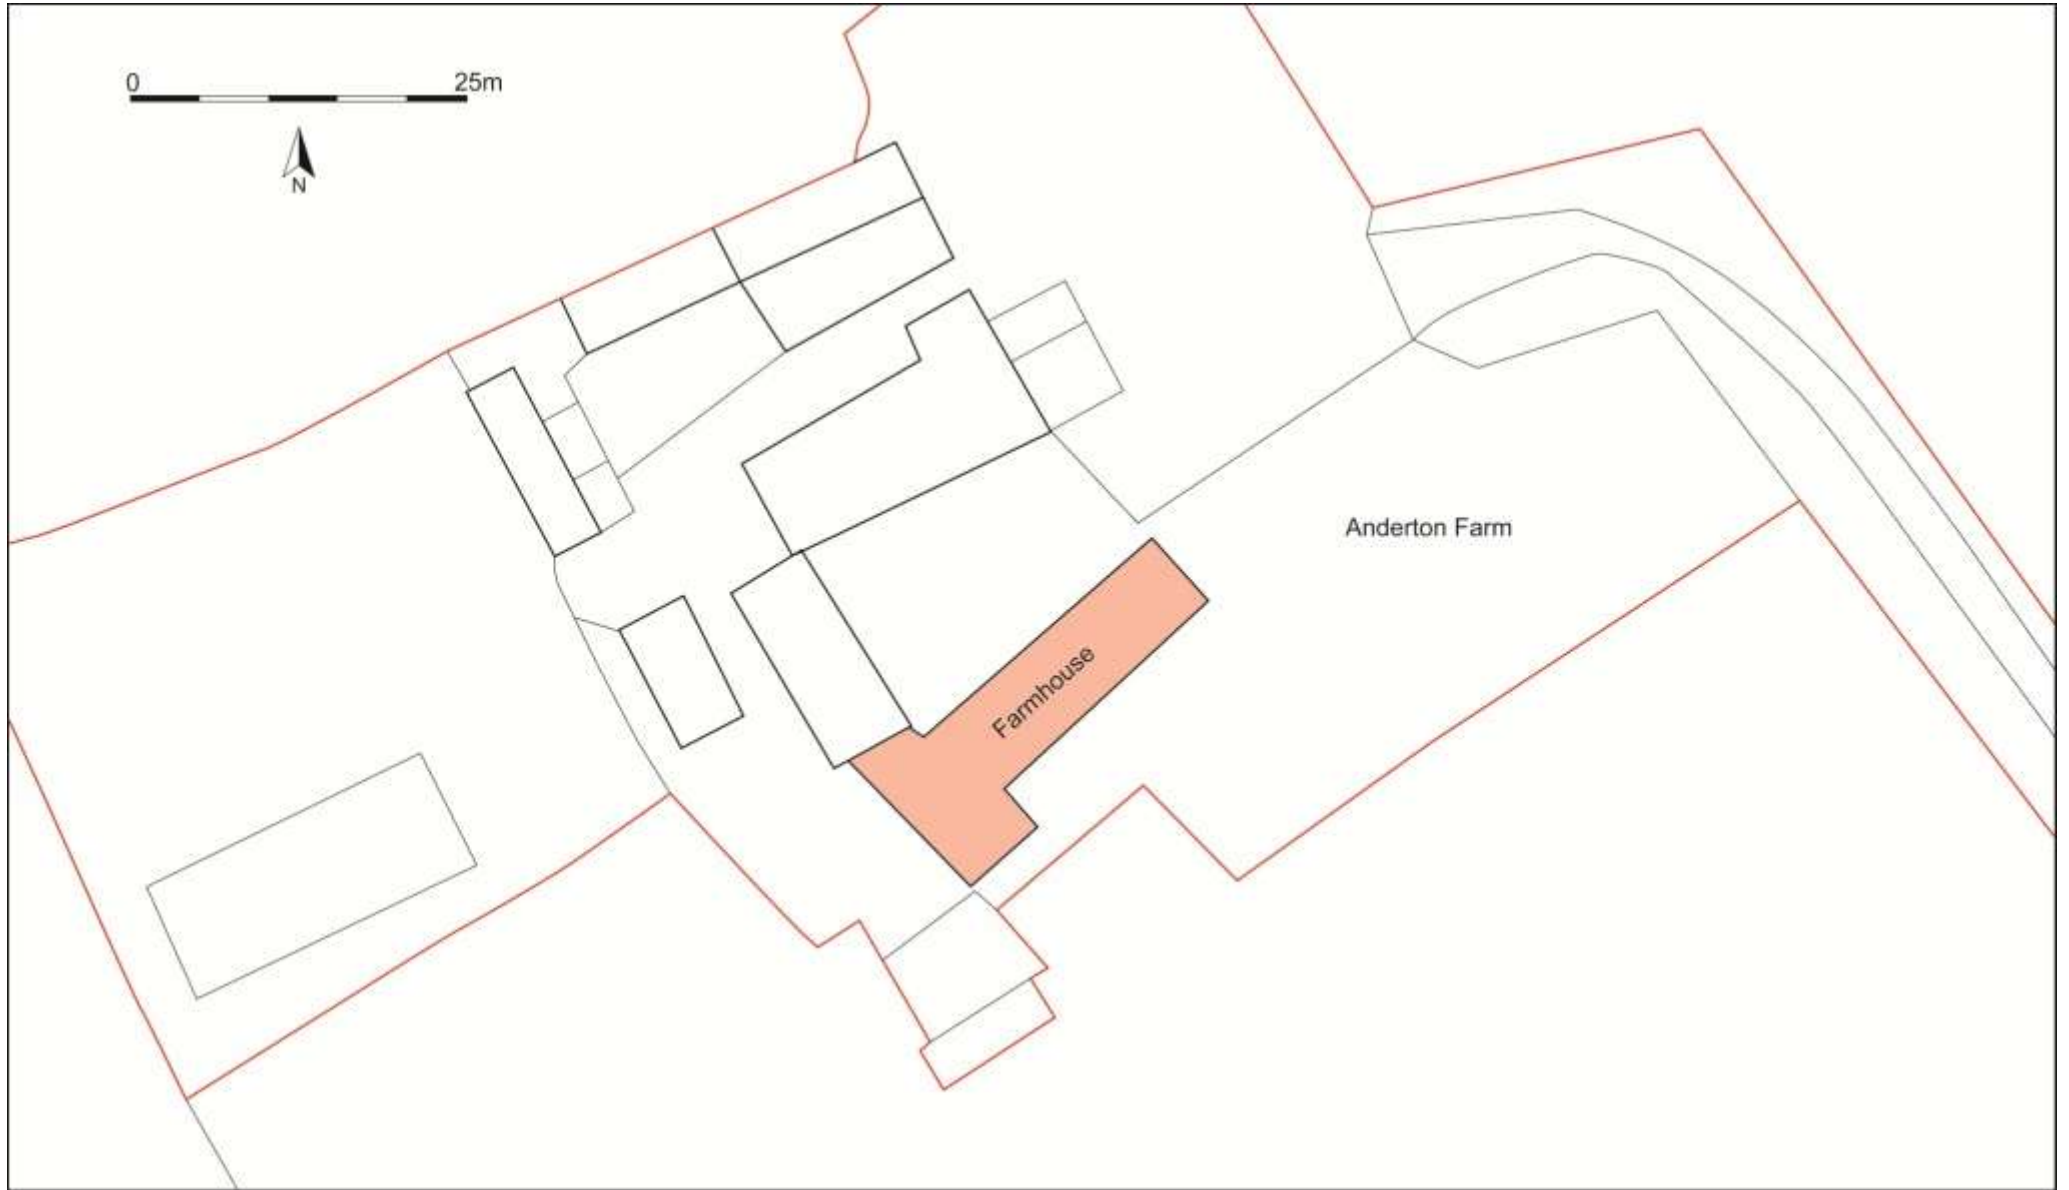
Detailed site plan of the Farmhouse and surrounding buildings.
